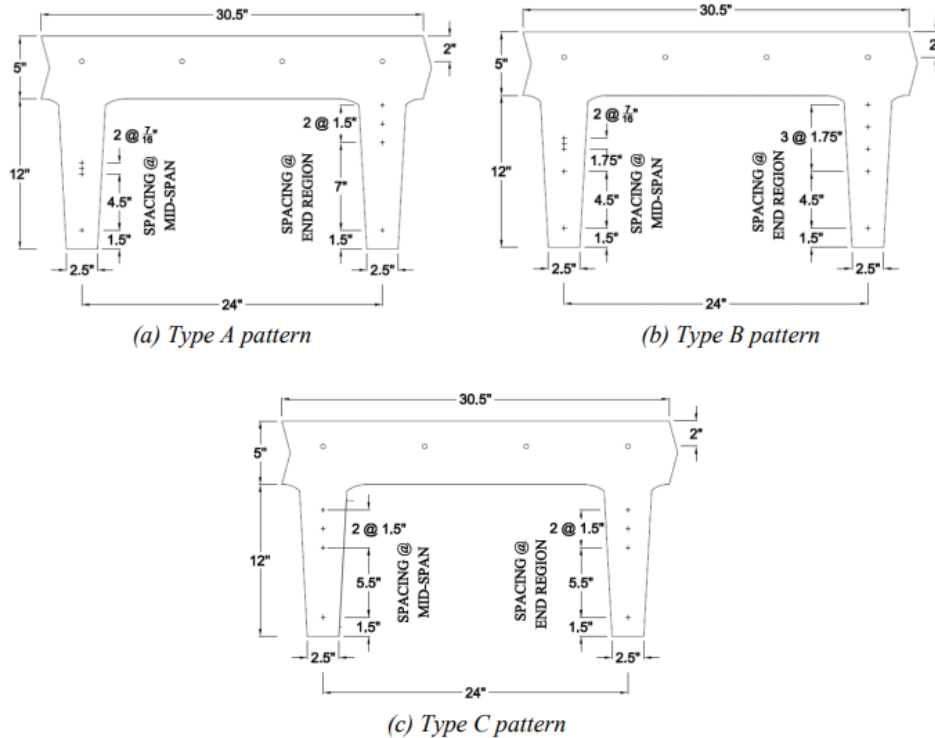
Standard C-channel beam cross-sections (adapted from (North Carolina DOT, 1966))
